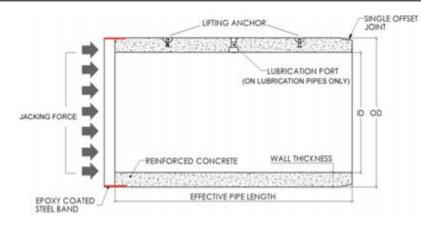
DECAST Ltd. Precast Steel Reinforced Concrete Pipe
